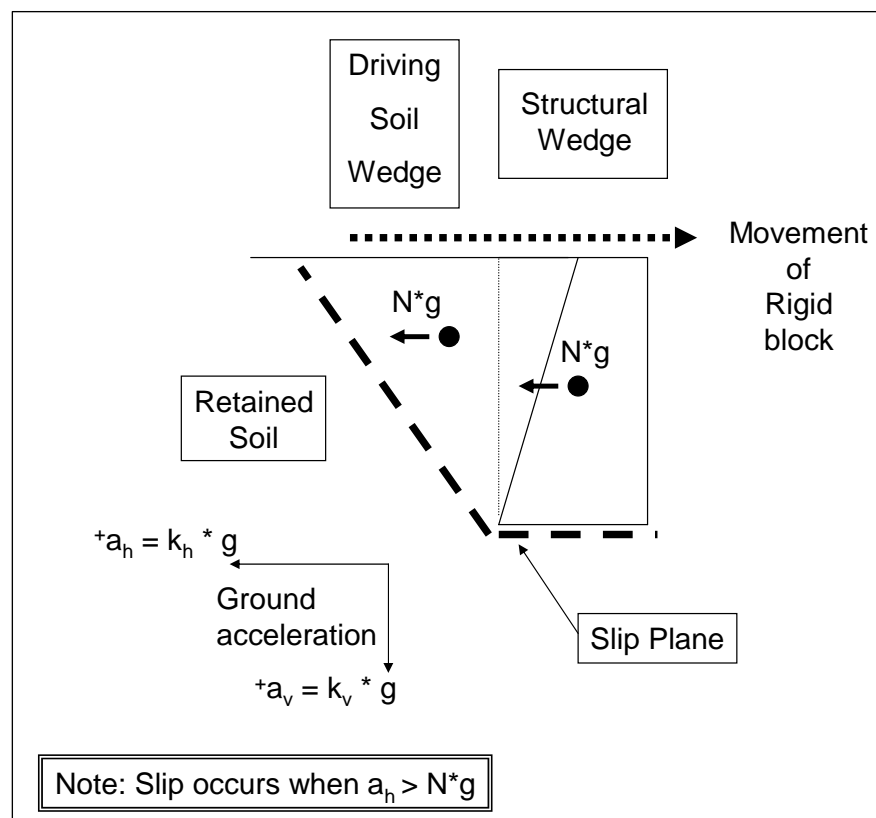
Gravity retaining wall and failure wedge treated as a sliding block (after Whitman 1990).
